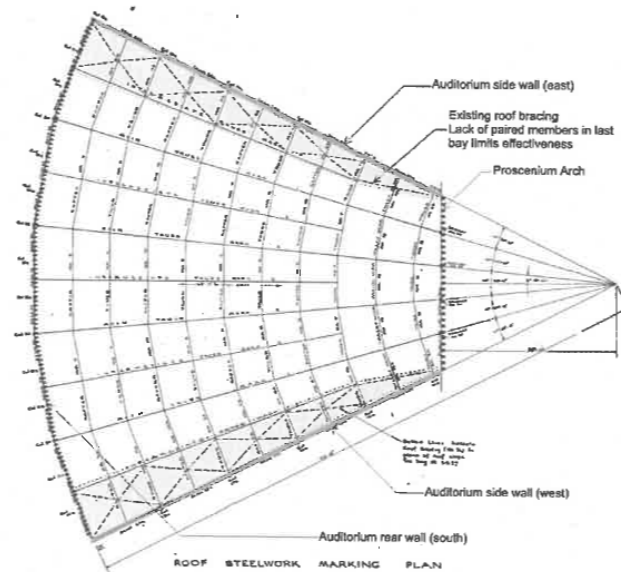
Original auditorium steel framing plan indicating walls and bracing
